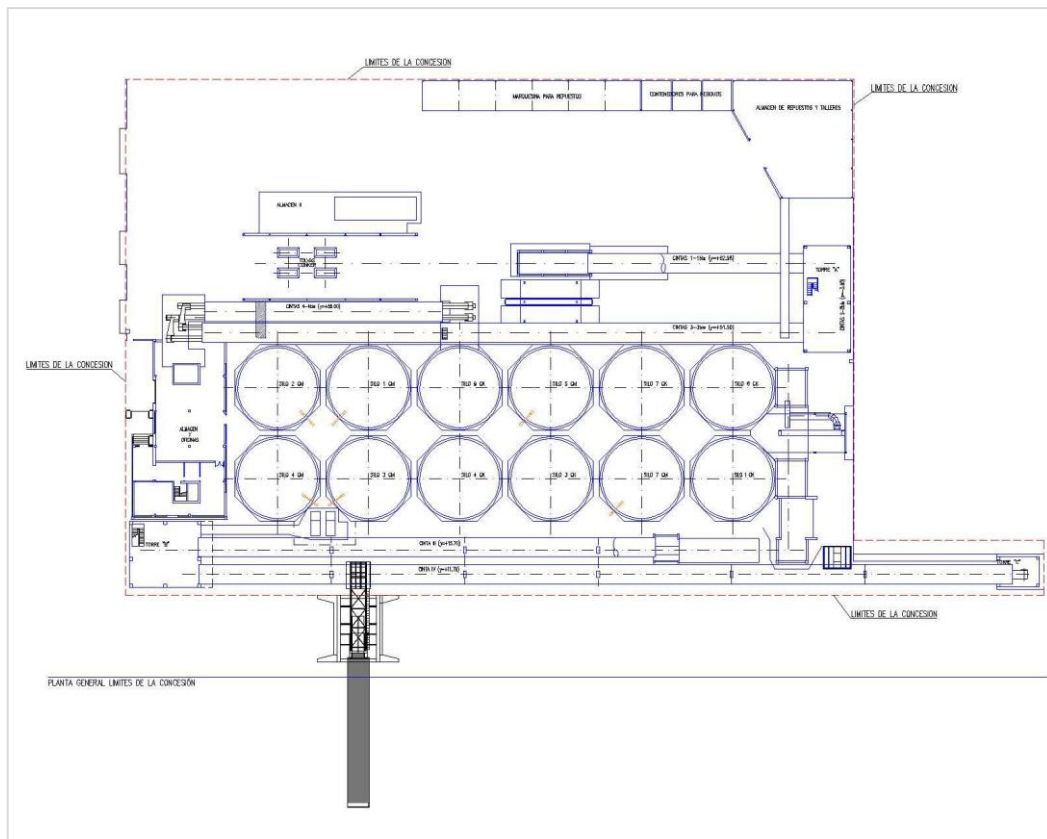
Floor plant of Portcemen facilities. It shows the arrangement of the 12 silos located in a battery of 6 silos parallel to the dock. It also shows the loading and unloading equipment and the conveyor belt. Source: <http://www.portcemen.com>
